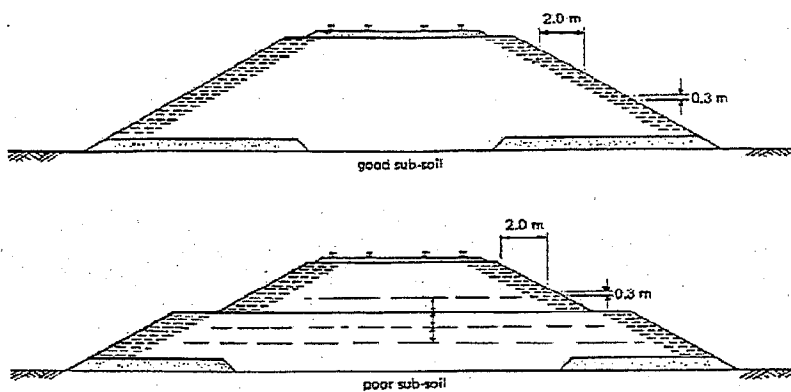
Railway embankments, (Japanese National Railway) in which geosynthetics are used for erosion control and stabilizing slopes, as well as base reinforcement
